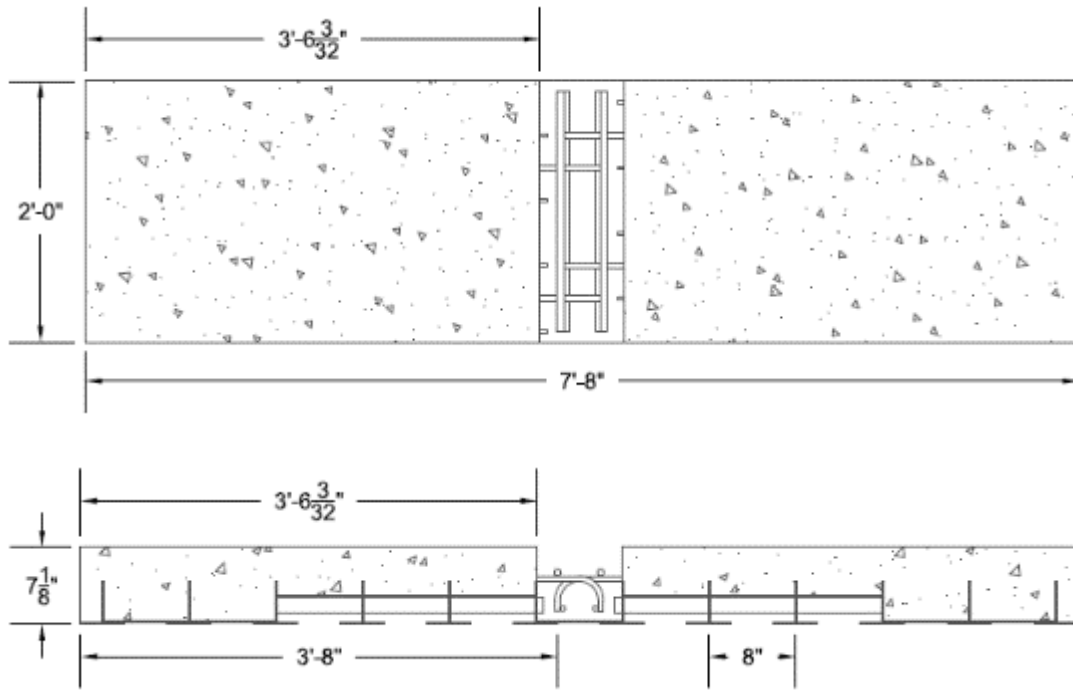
Staggered Hook Reinforced Joined Panels Plan and Elevation
